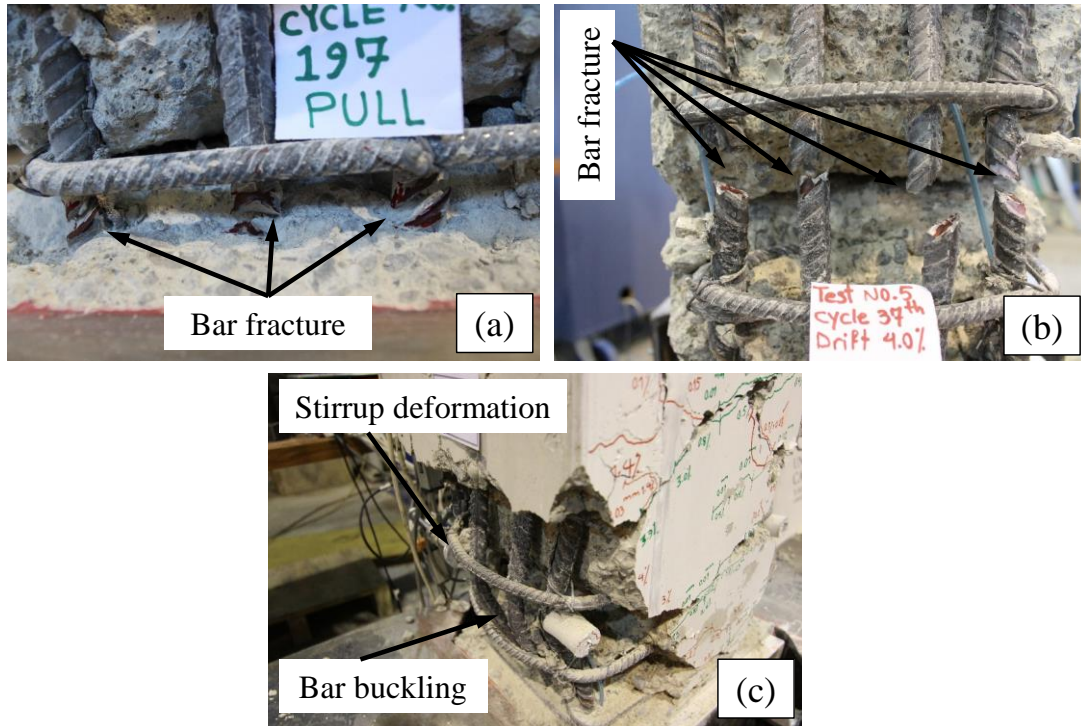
Typical failure modes: (a) bar fracture at 2%; (b) bar fracture at 4%; (c) bar buckling and stirrup deformation at 4%
